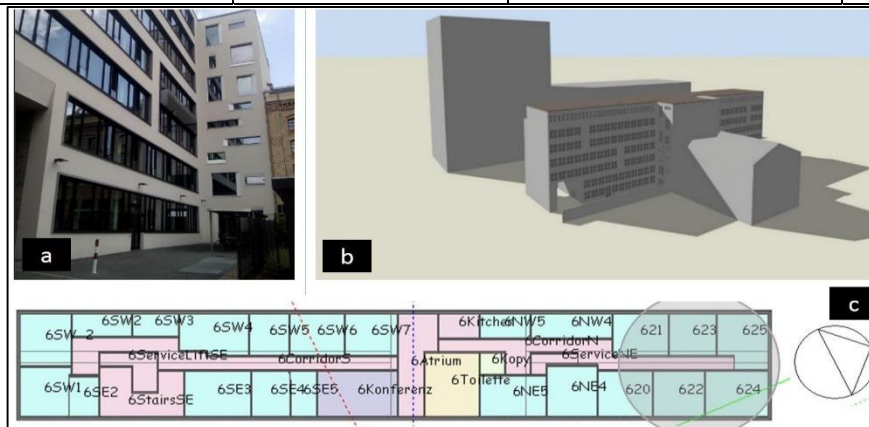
The case study building: a) backside, b) model, c) plan of the 6<sup>th</sup> floor
